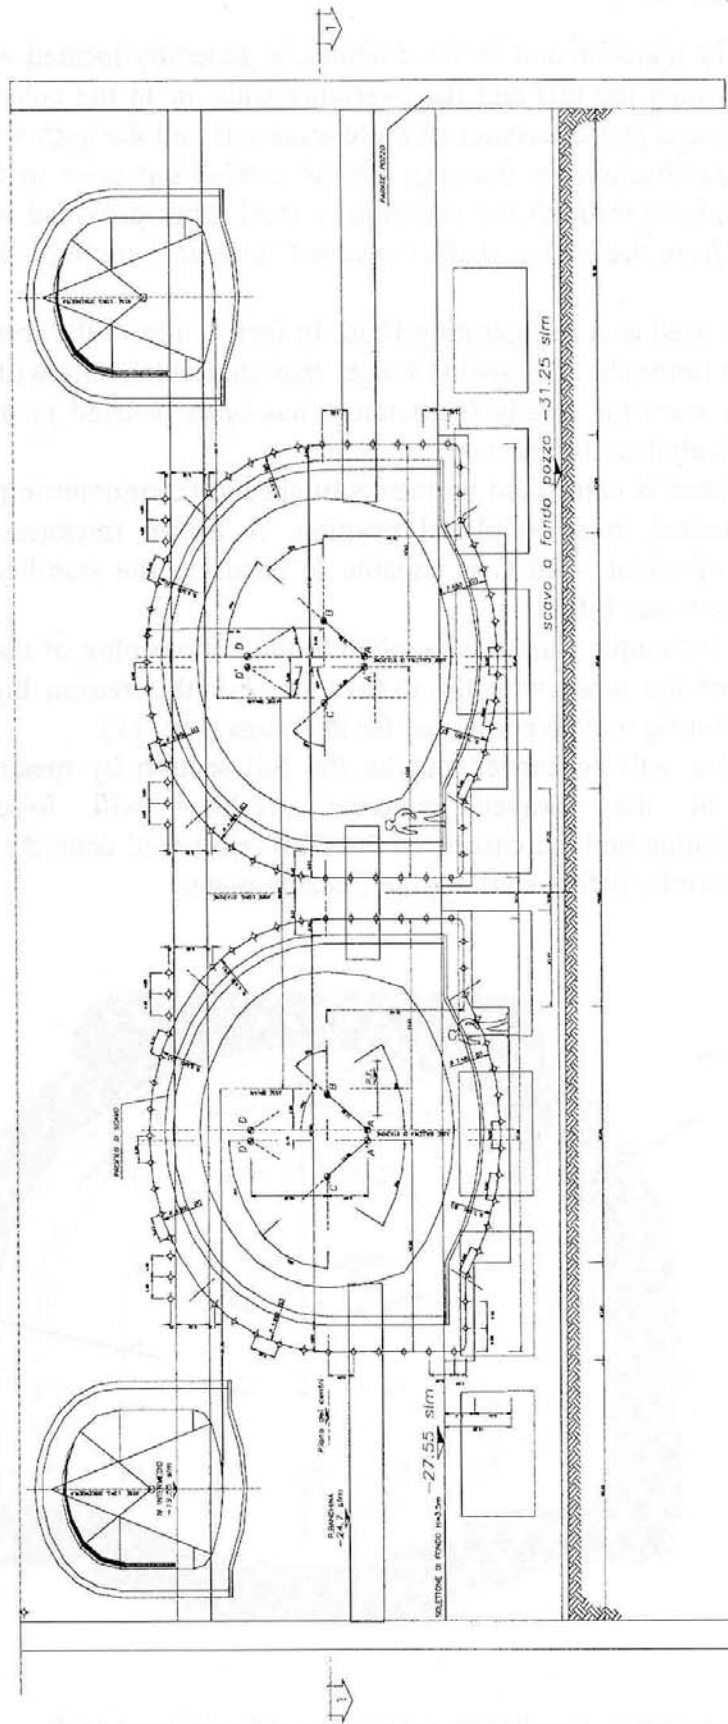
University Station; prospect of the excavation front of the platform and inclined tunnels
